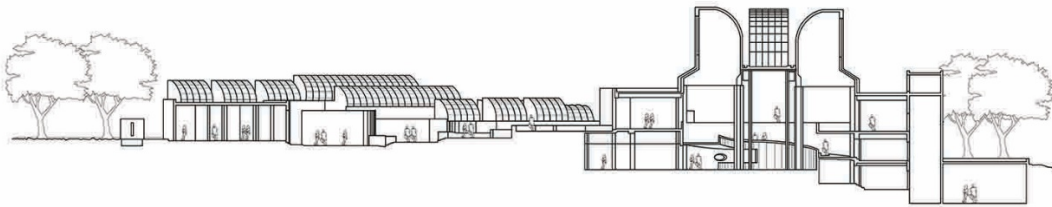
A section-elevation demonstrating the façade and formal combination of the museum. Drawing by the Author (2020).
